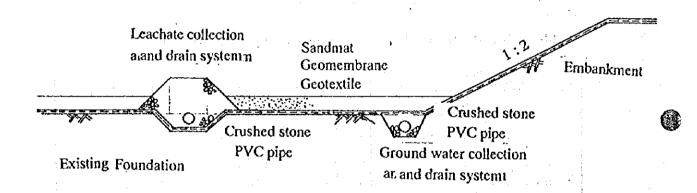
Typical Cross Section of Liner System in This Study
